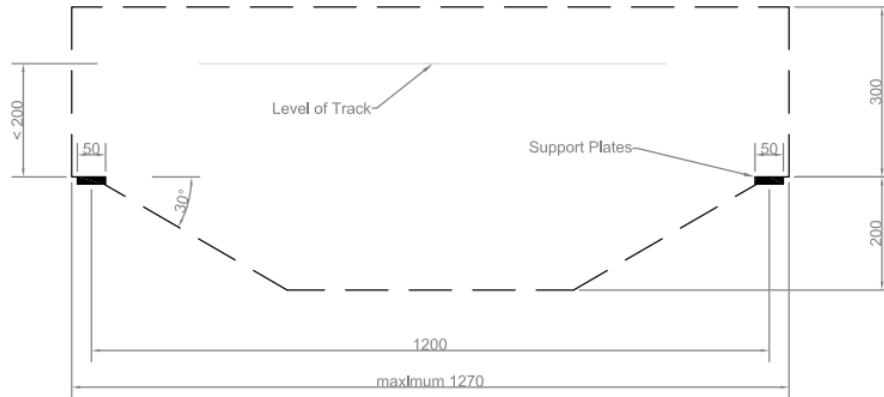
Dimensional constraints of the bridge shown in an elevation view.
